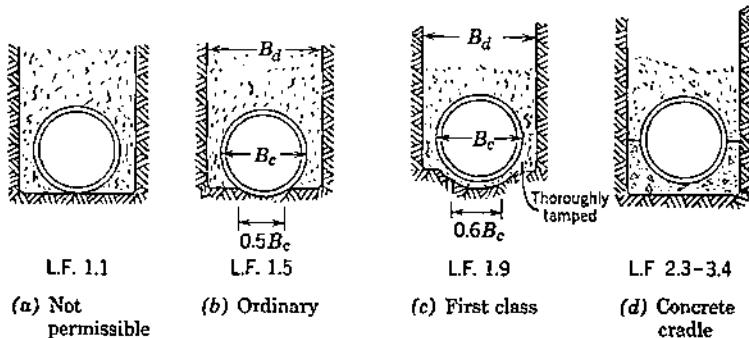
Typical bedding specifications for ditch conduits. (Redrawn from Spangler,¹¹ p. 873, Fig. 13.)
